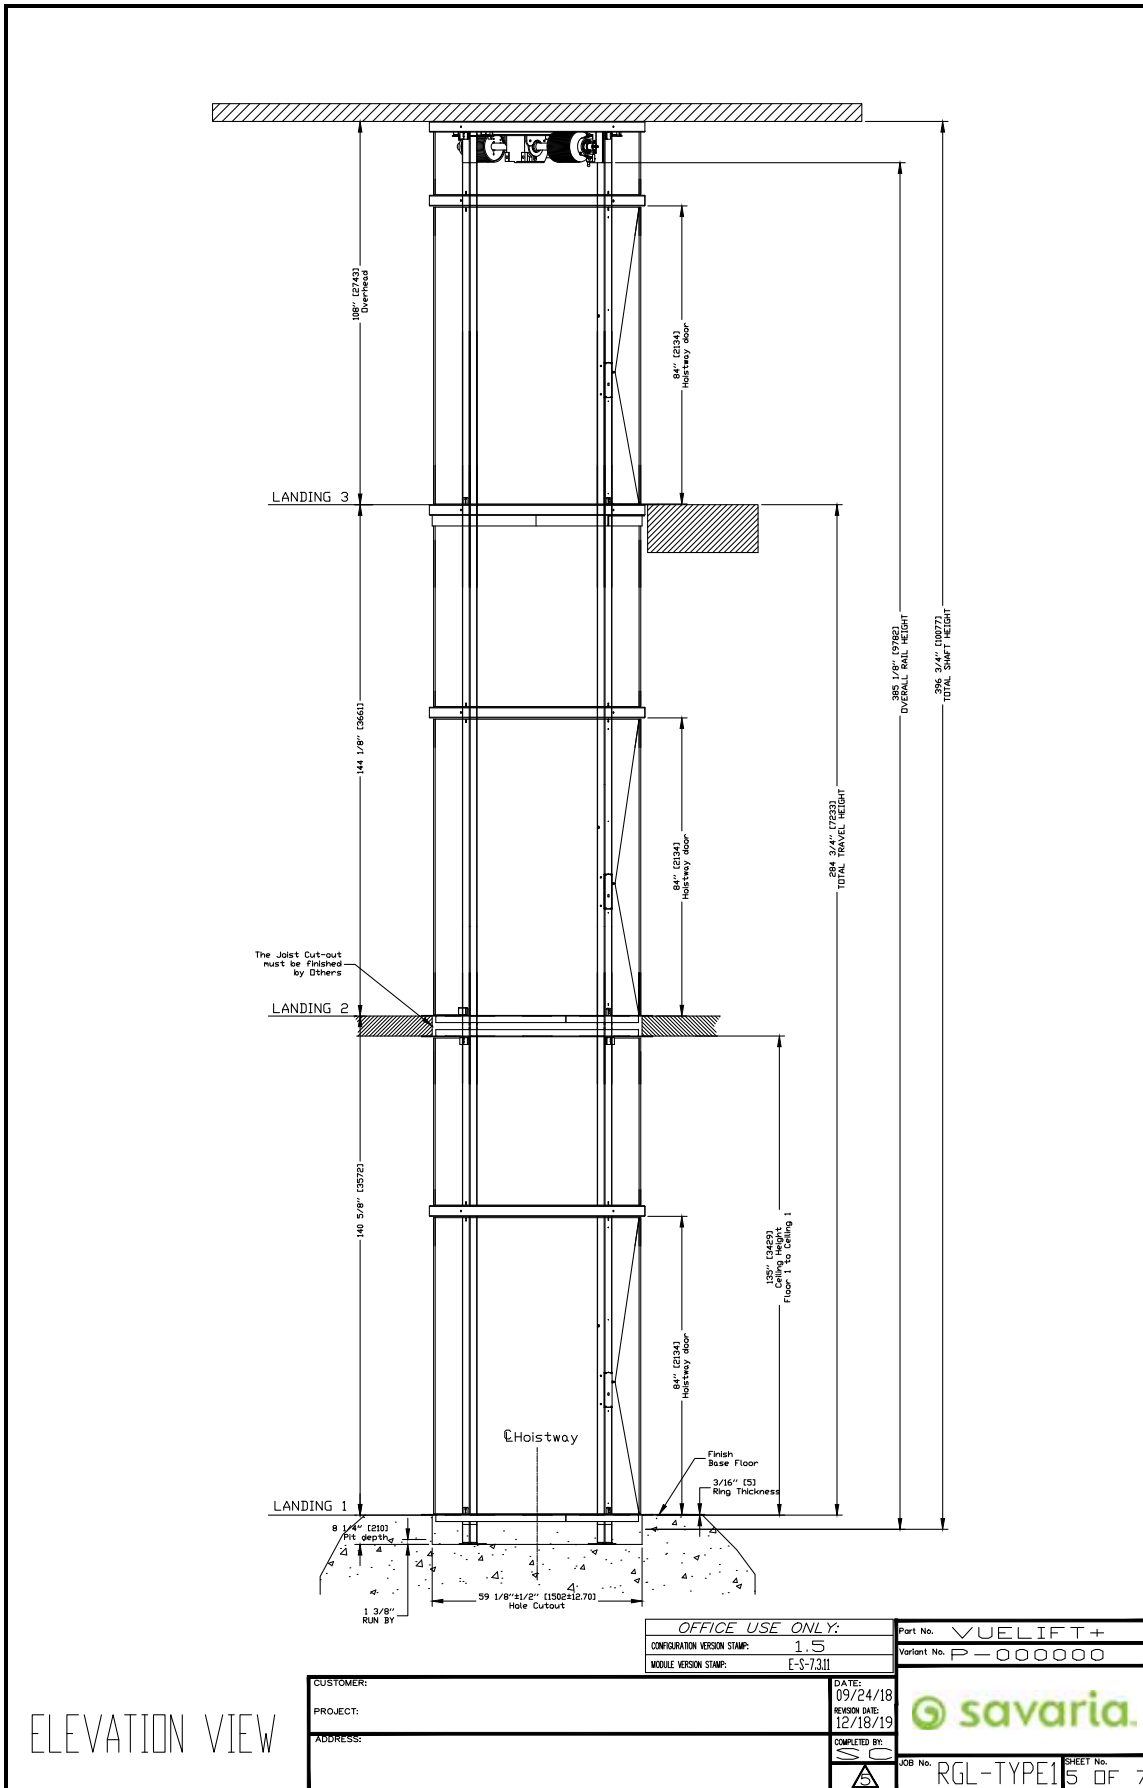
Elevation view - round+ glass (RGL) - extra header rings if floor-to-floor height > 14 ft
